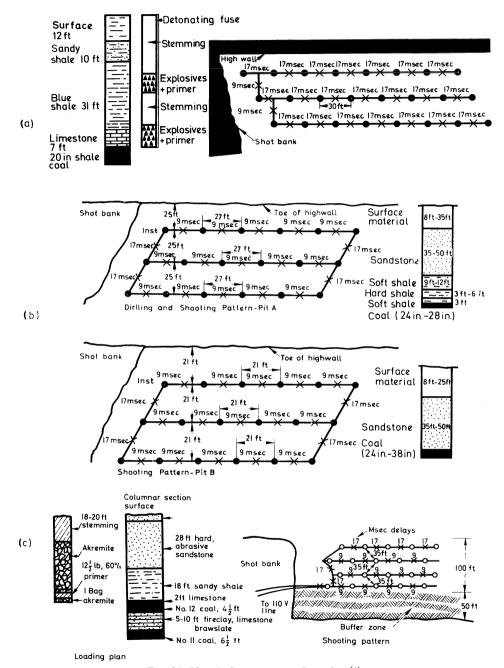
Blast hole patterns and spacing.⁽²⁾
